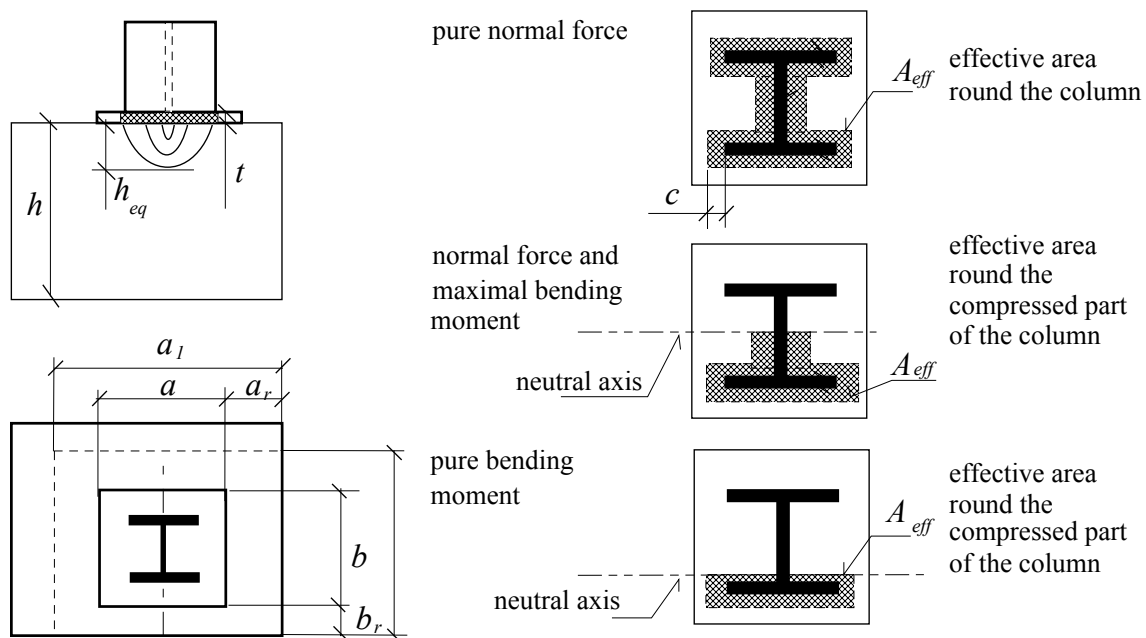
Local deformation of the concrete block, the effective area under the flexible plate
